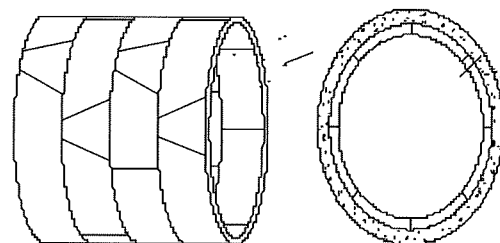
Cross-section of standard support and waterproofing in ground tunnelled with a tbn
